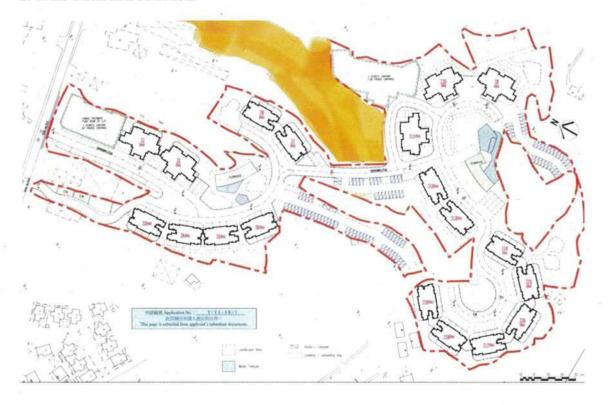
Wah Yuen, as shaded in yellow (Source: Gist Pg 9: Indicative Master Layout Plan)
